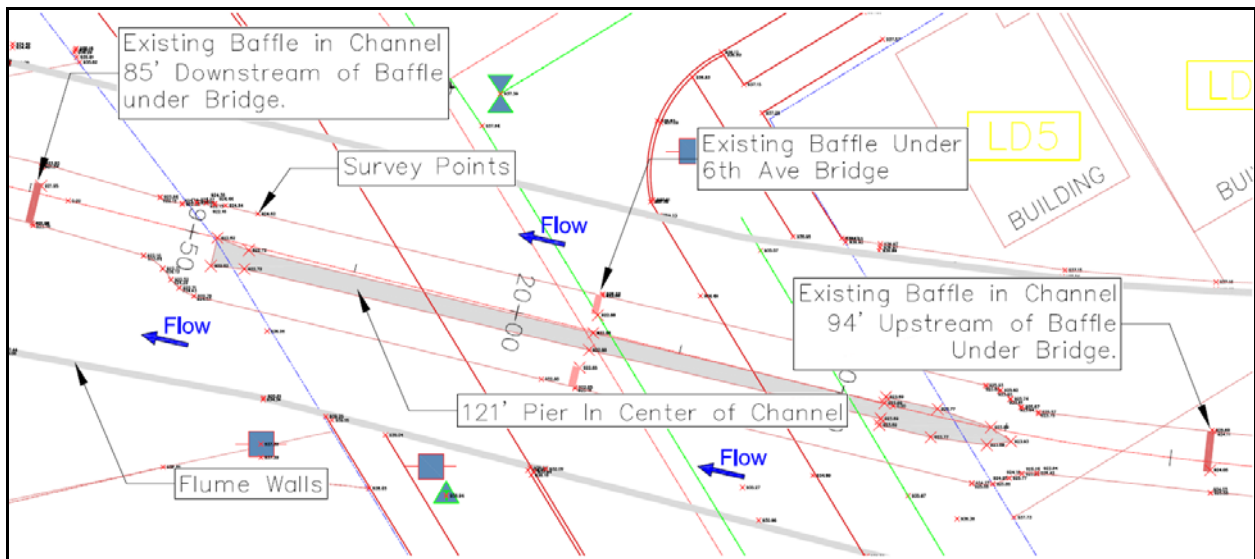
N. 6th Ave Bridge Plan View. Flow is from right to left. The shaded area is the concrete pier.
